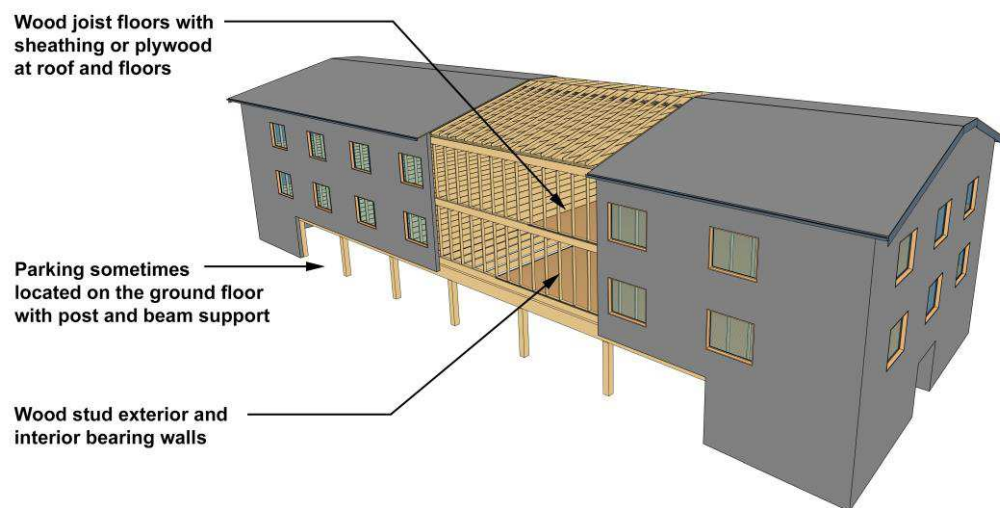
Schematic illustration of an engineered WLF *building* (Figure adapted from FEMA 547, FEMA, 2006)
